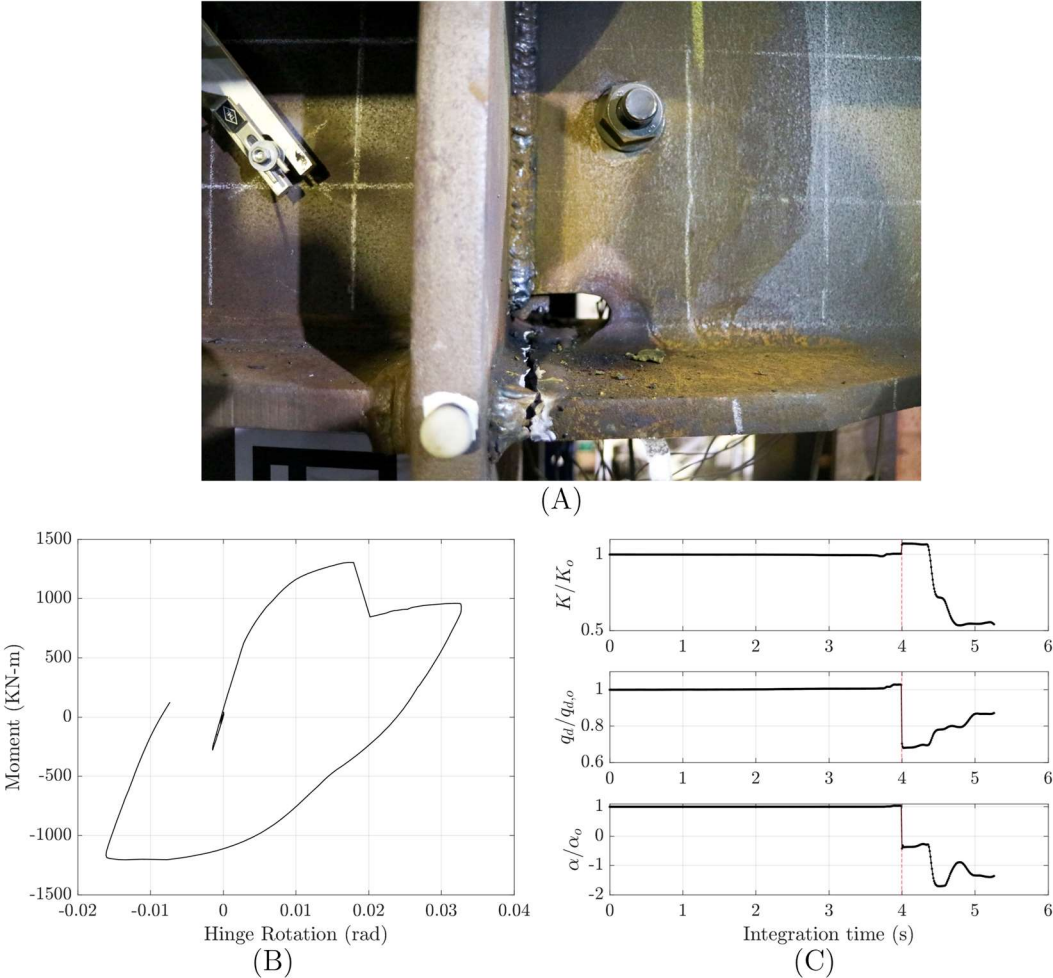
Beam flange fracture: (A) close-up to weld fracture; (B) RBS hysteretic response; (C) Identified parameters normalized by the initial value.
